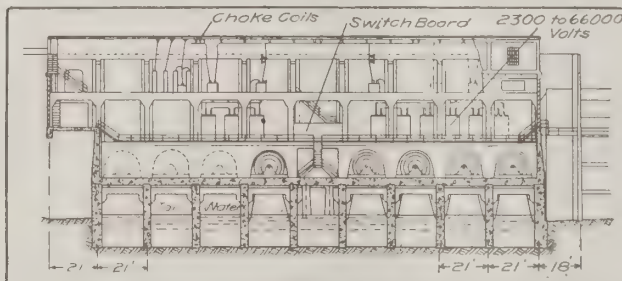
A. SECTION THROUGH STATION SHOWING ARRANGEMENT OF EQUIPMENT.
